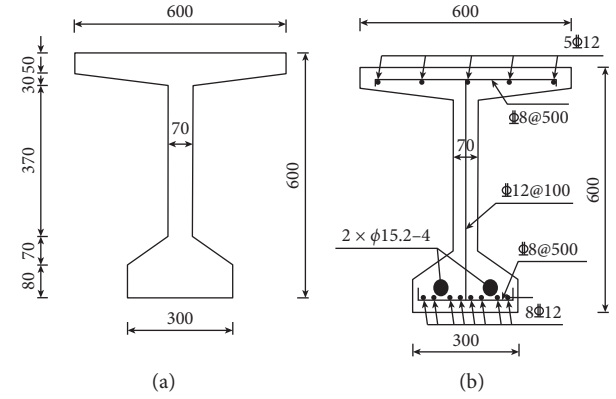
(a) Test beam section. (b) Longitudinal reinforcement layout (mm).
